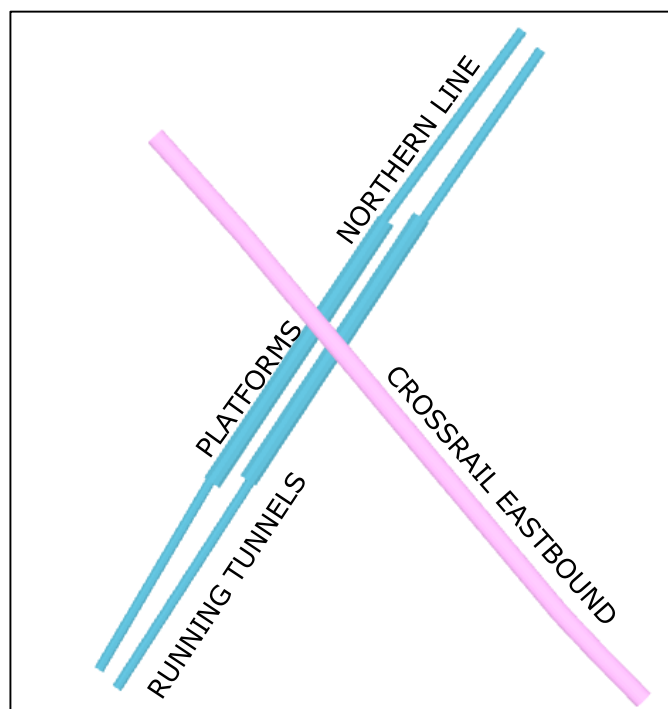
Northern Line running tunnels and platform and Crossrail east bound tunnel
